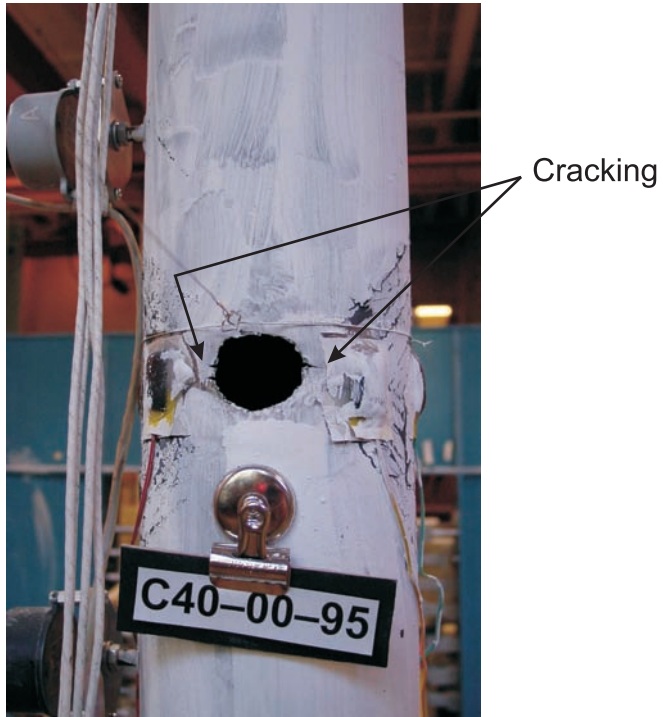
Front View of Cracking at Edges of Hole in Corrosion Patch (Load Step +1), Specimen C40-00-95
